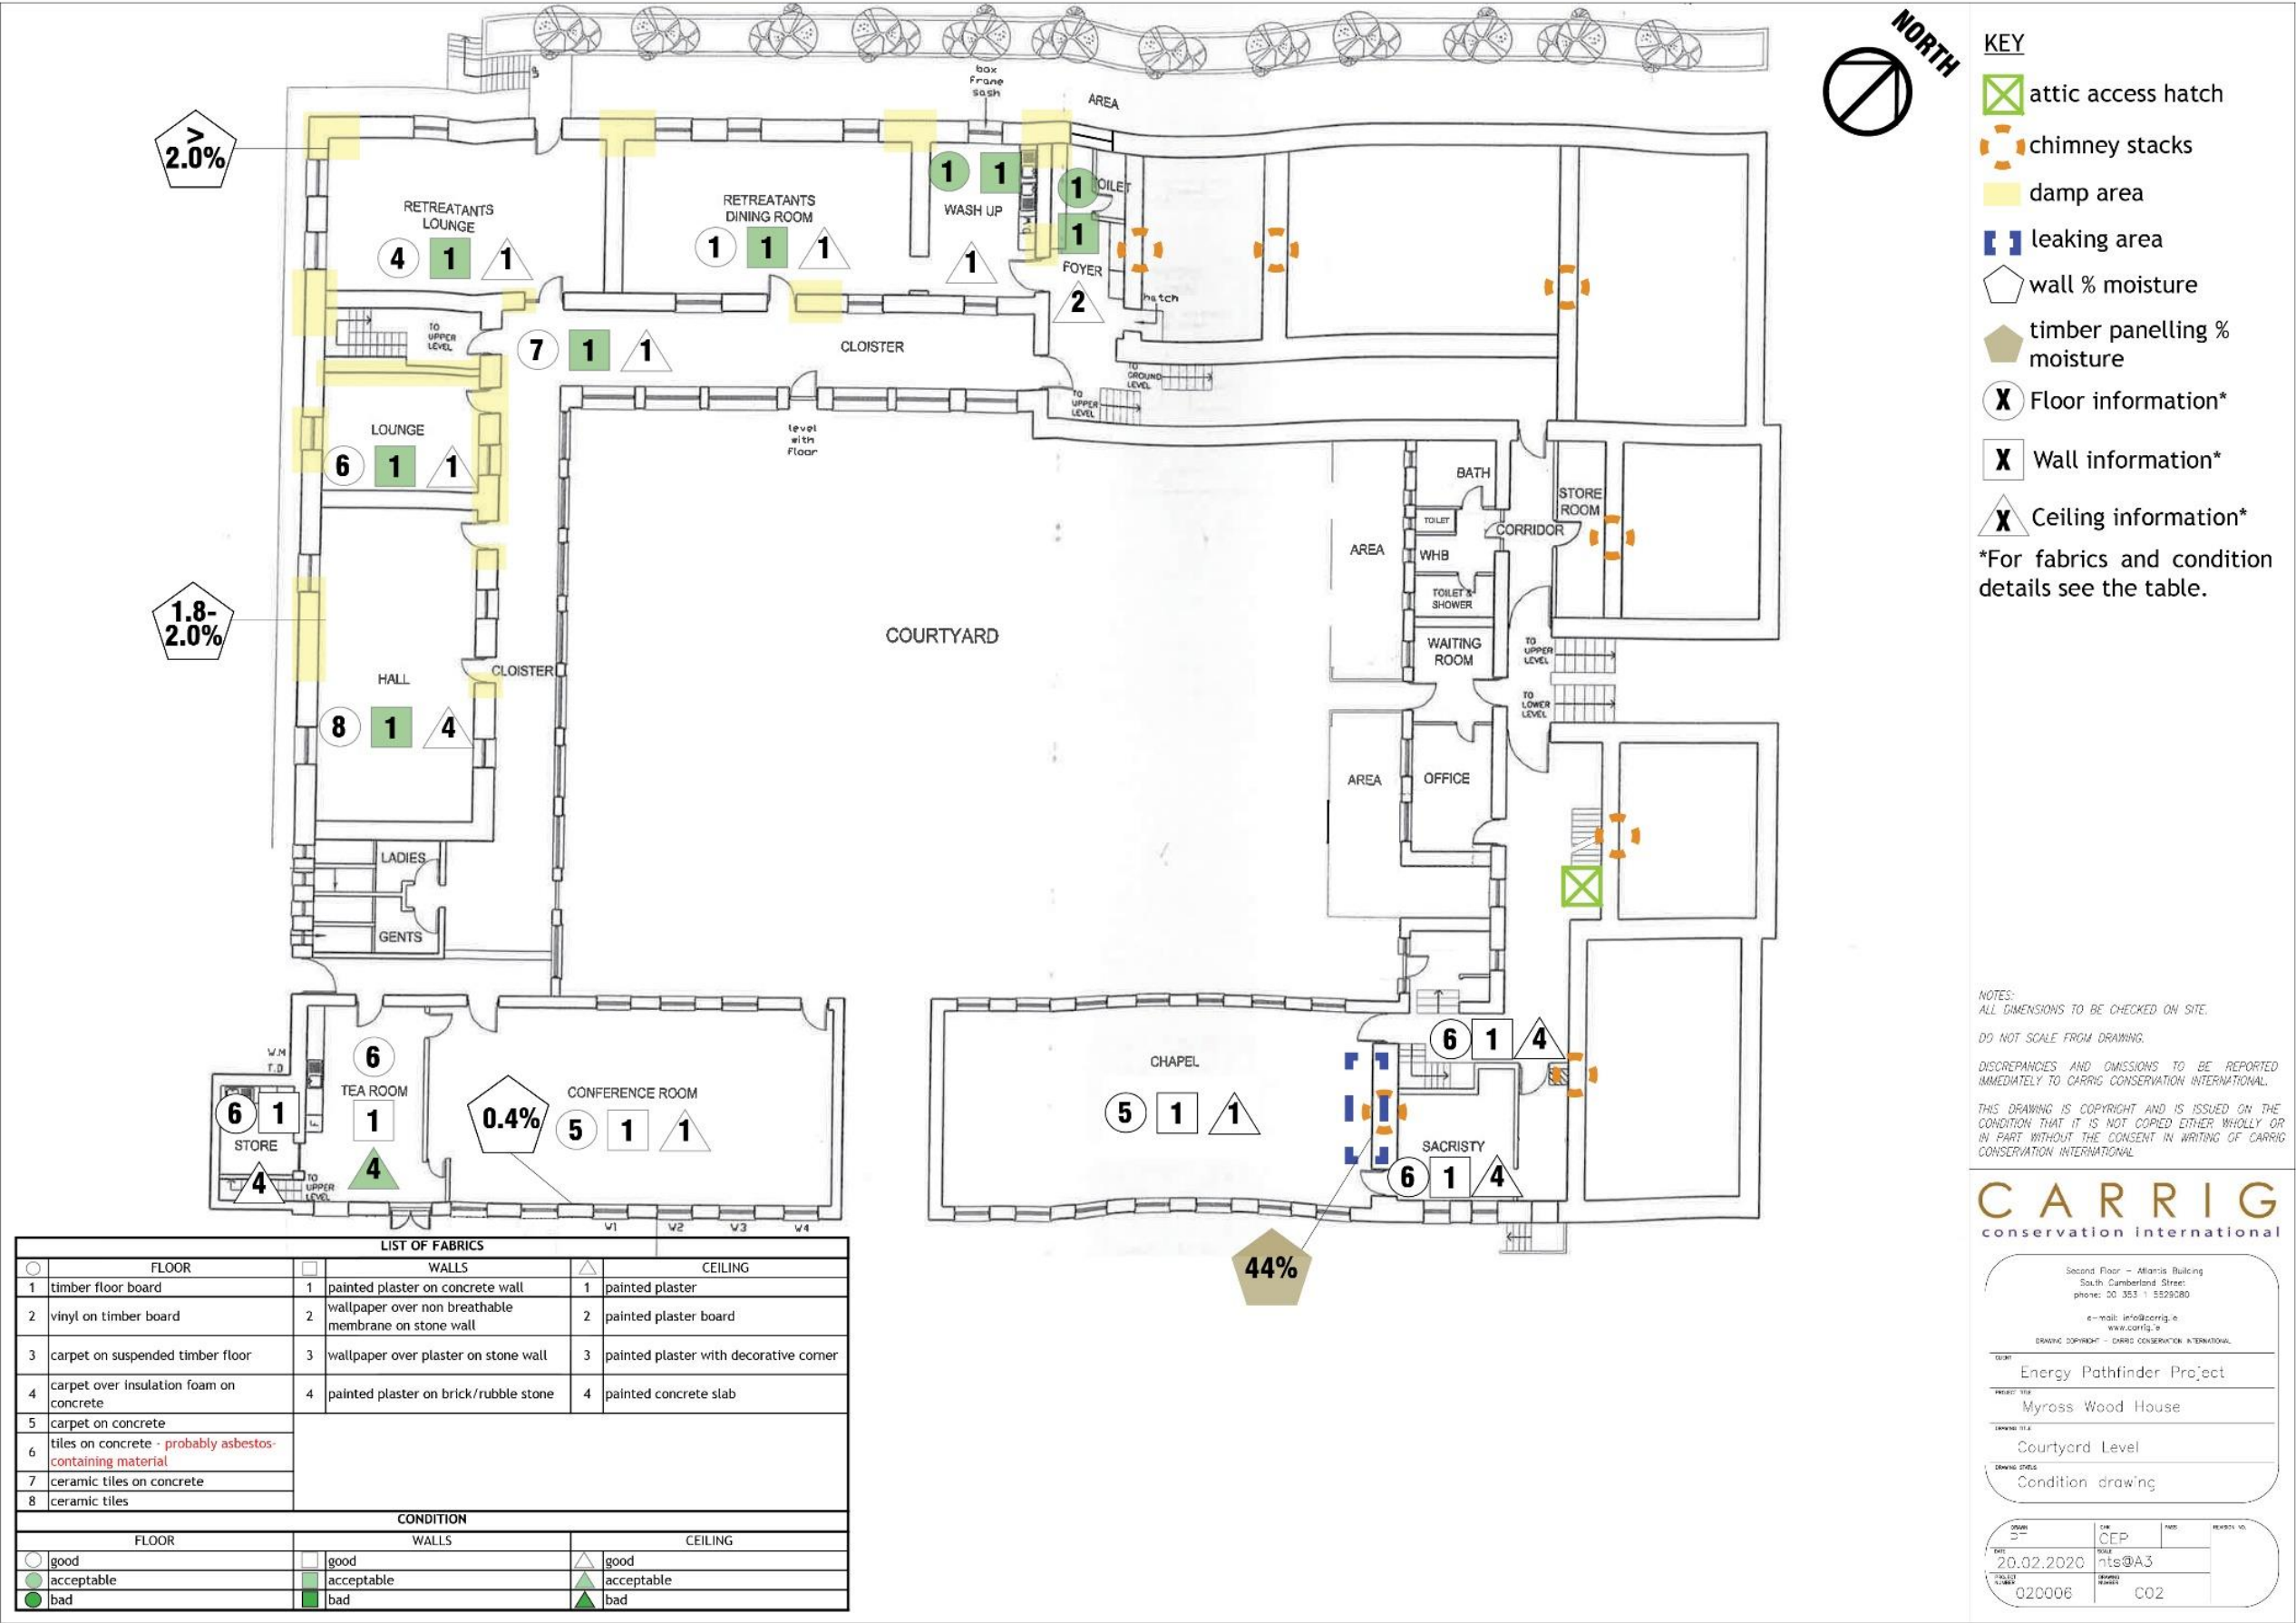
Condition drawing, courtyard level - Myross Wood House.
